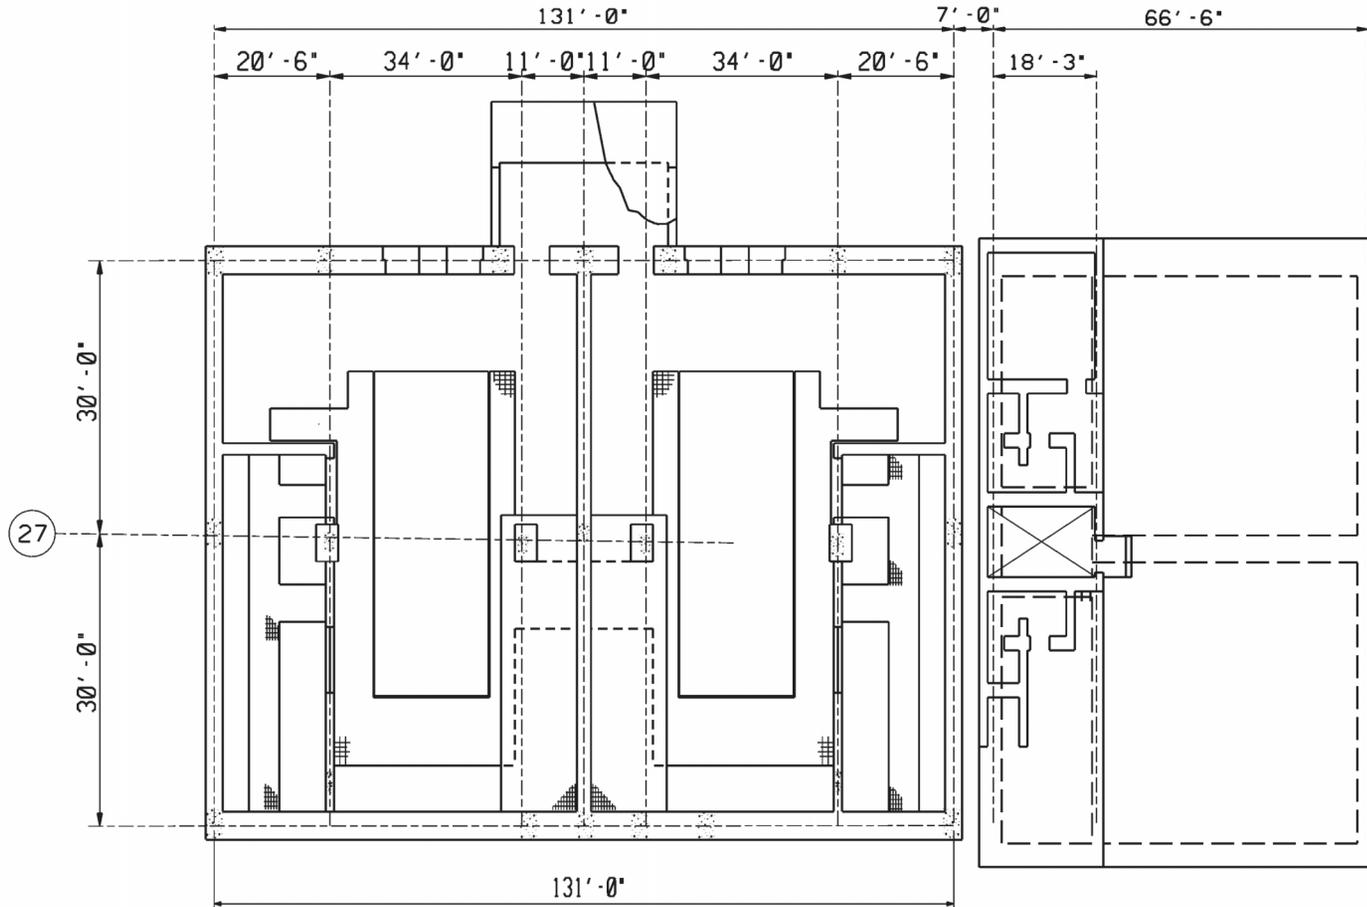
Emergency Diesel Generator Building Block Plan
